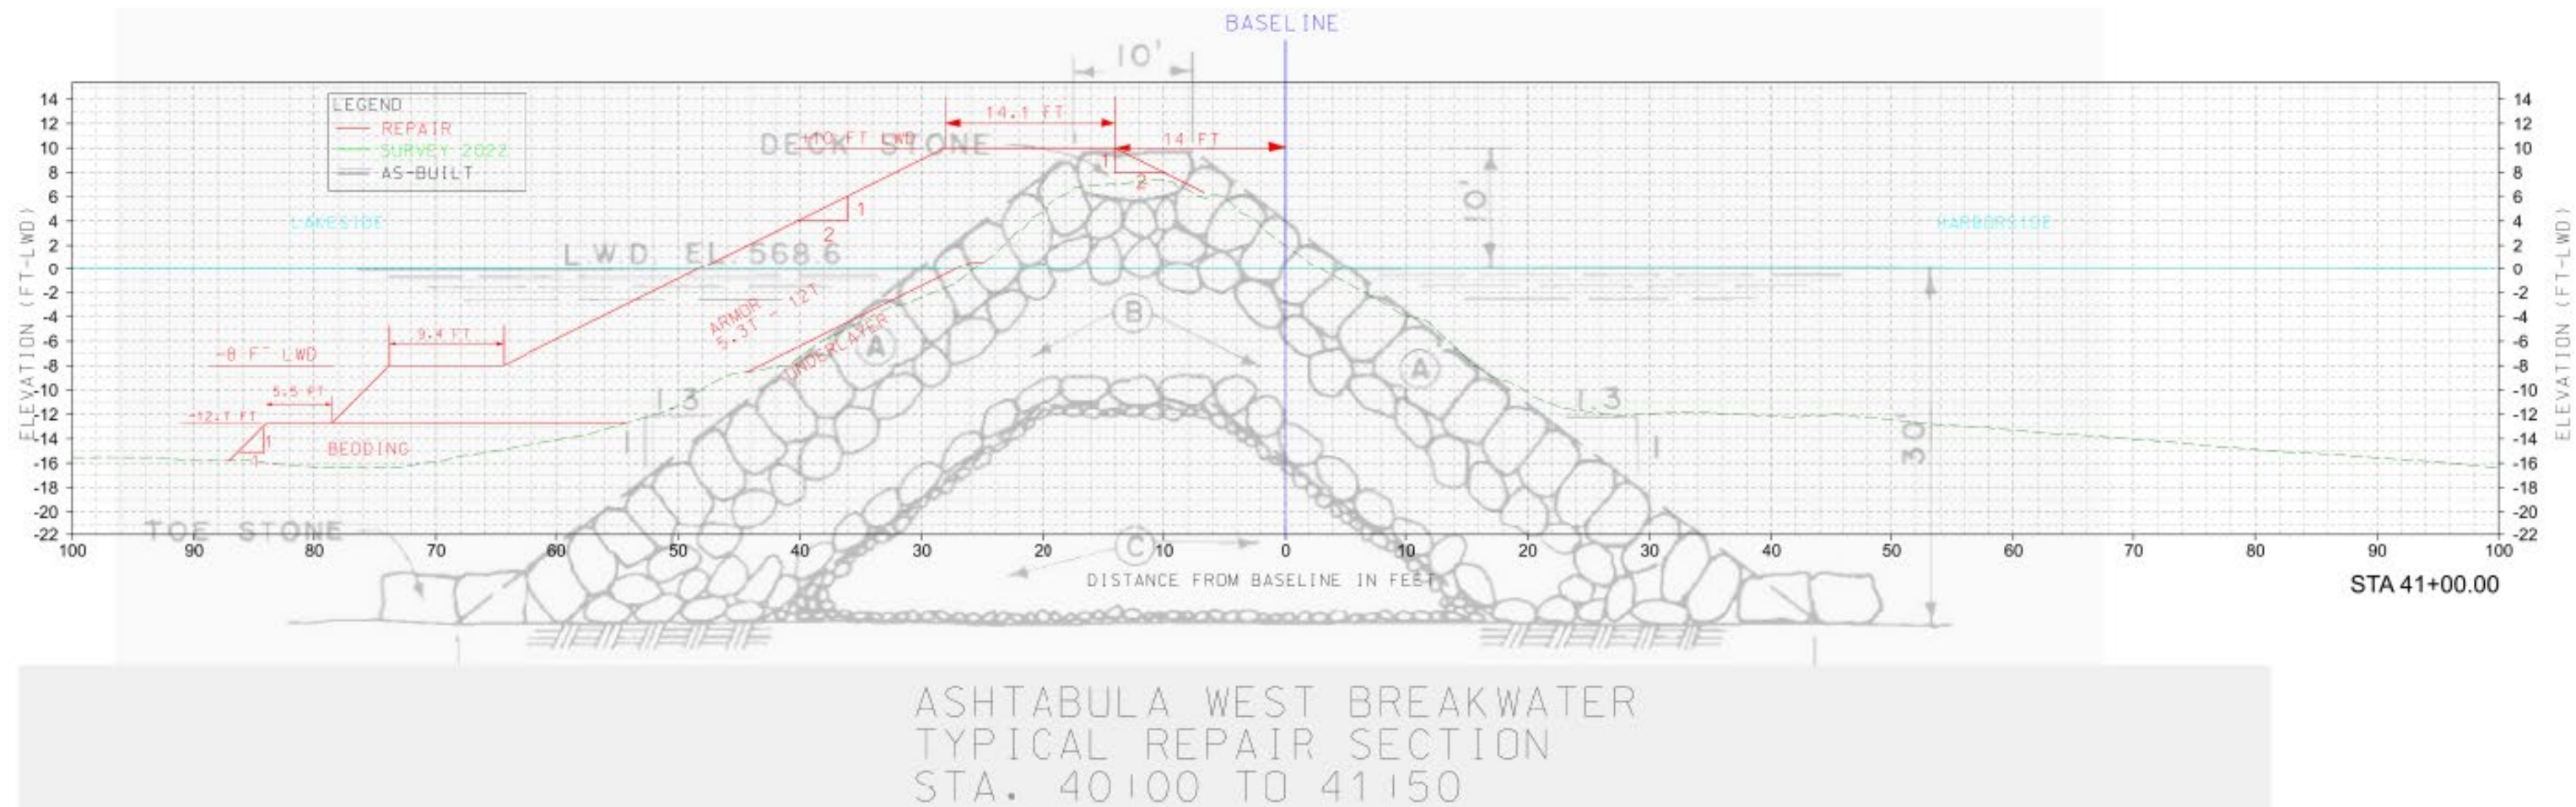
Typical Repair Cross Section, Zone 1 Stations 40+00 to 41+50
